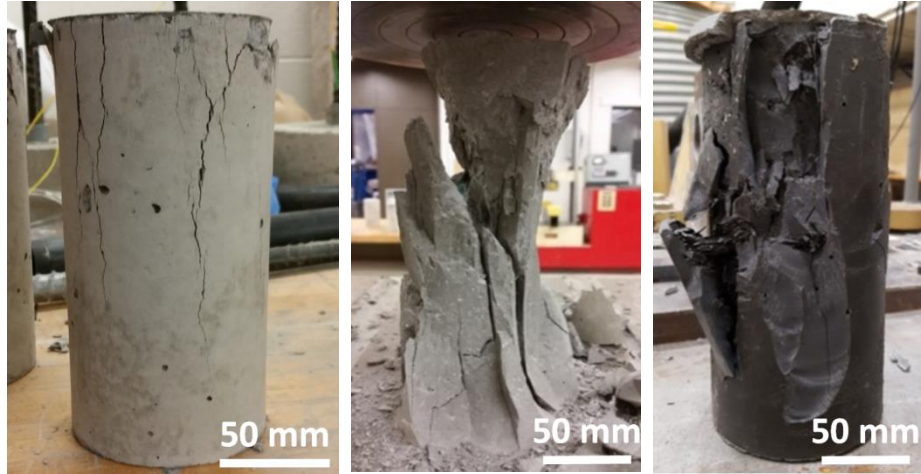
Compression test specimens post failure. Left; Concrete. Center; Cementitious grout. Right; Resin grout.
